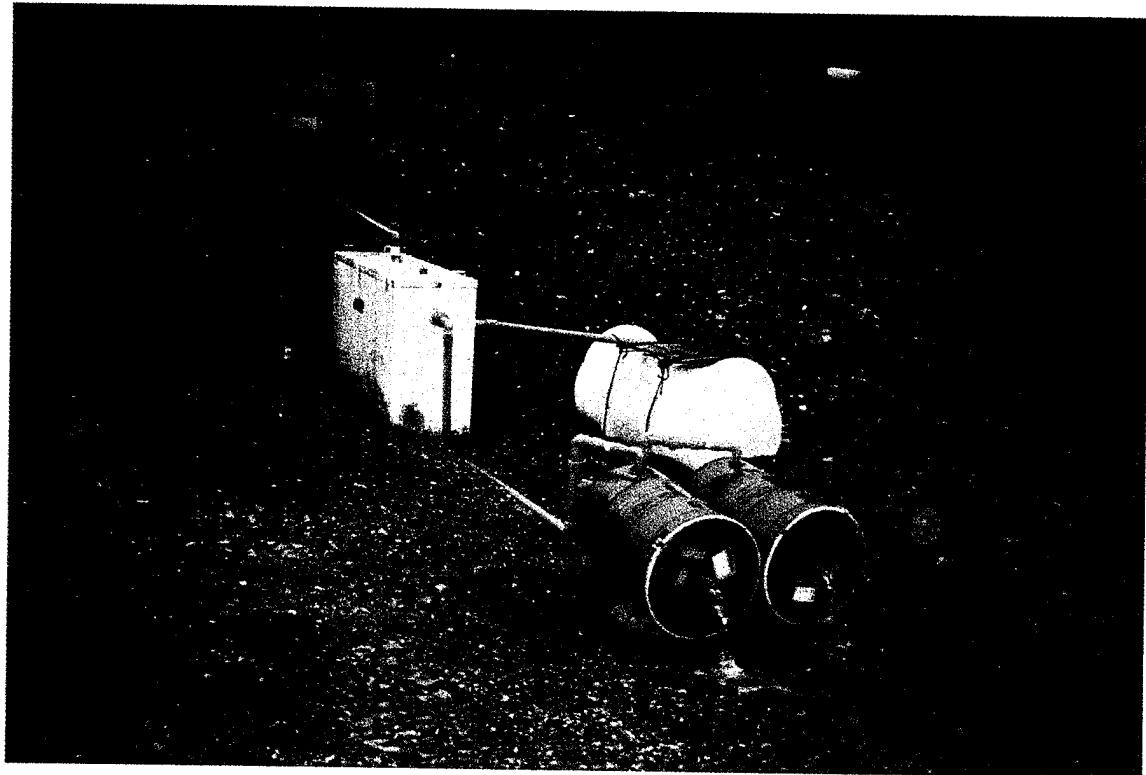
The sump consisted of a culvert with a welded metal base.
